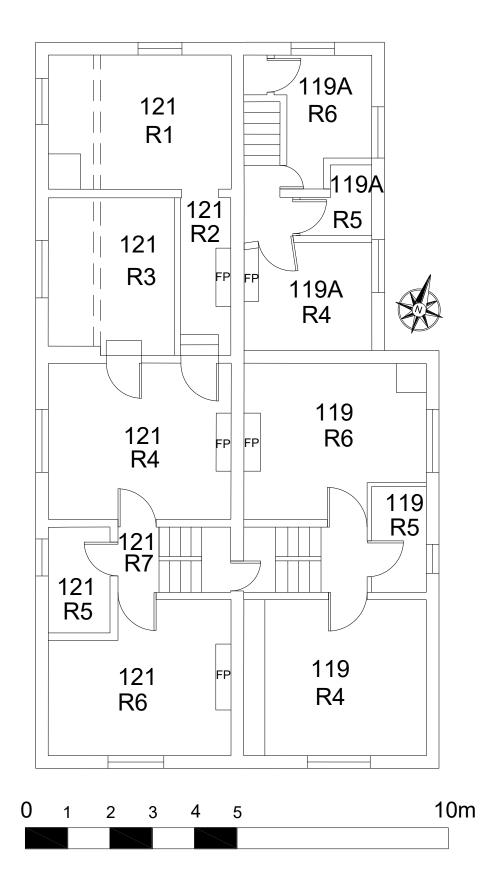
First floor plan of Nos 119, 119A and 121 Paynes Road
